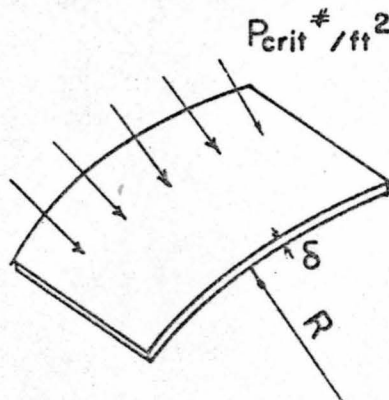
MEMBRANE STRESSES ON FLEXIBLE CONDUIT TYPE SECTION
